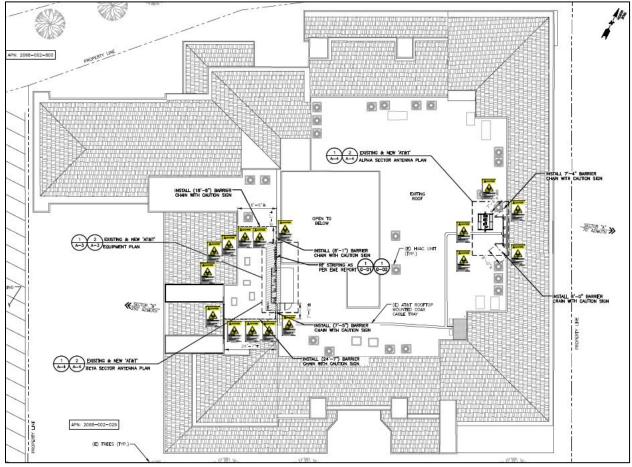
Proposed location of the RF caution signage on the rooftop (Source: Plans Page A-2).
